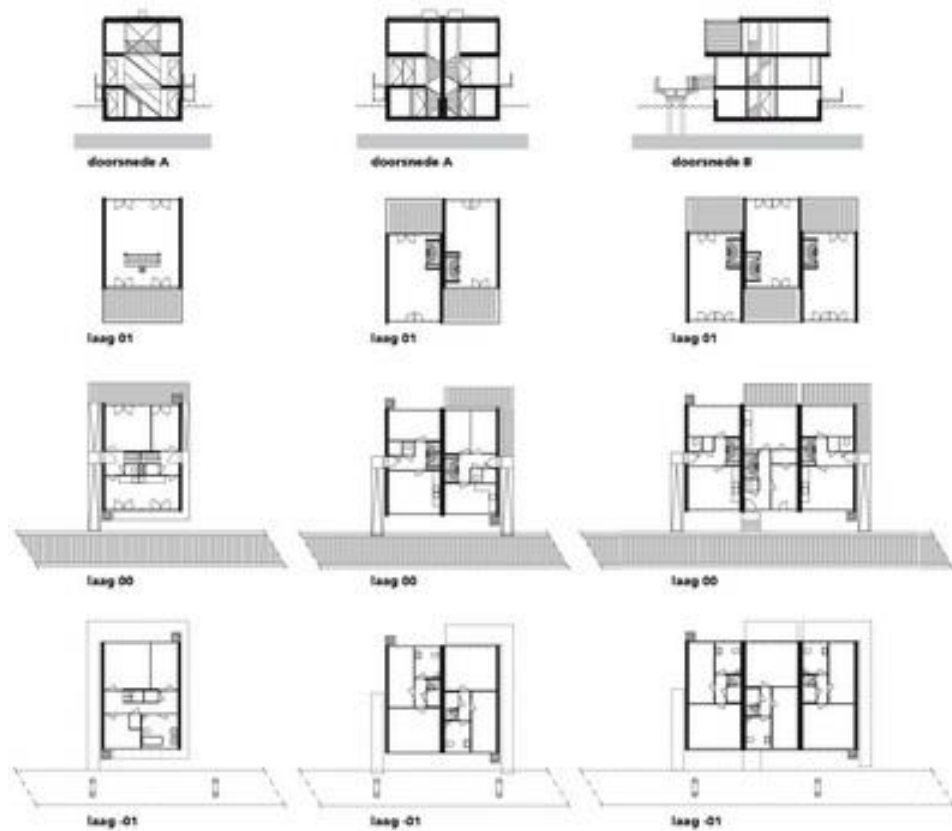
(Floors -1, 1, and 2 and Cross Sections of a typical IJburg home)
